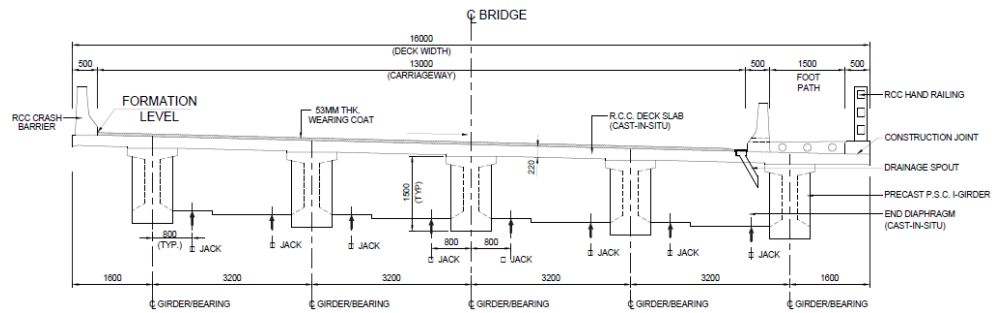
2 Cross section of 25m span OC post tensioned I girder at support
